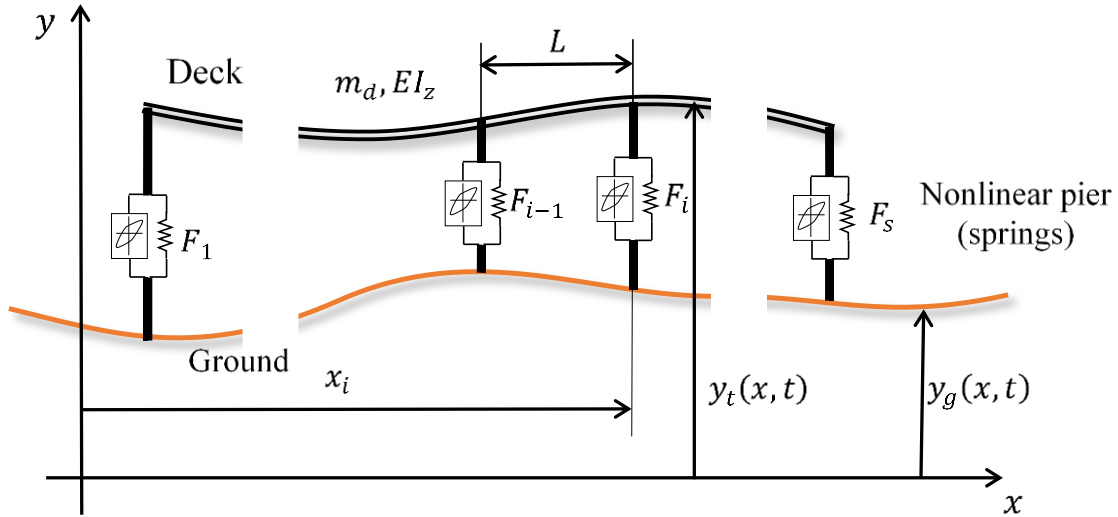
; The x-y plan view of bridge layout including transversal deformation of piers, ground, and deck
